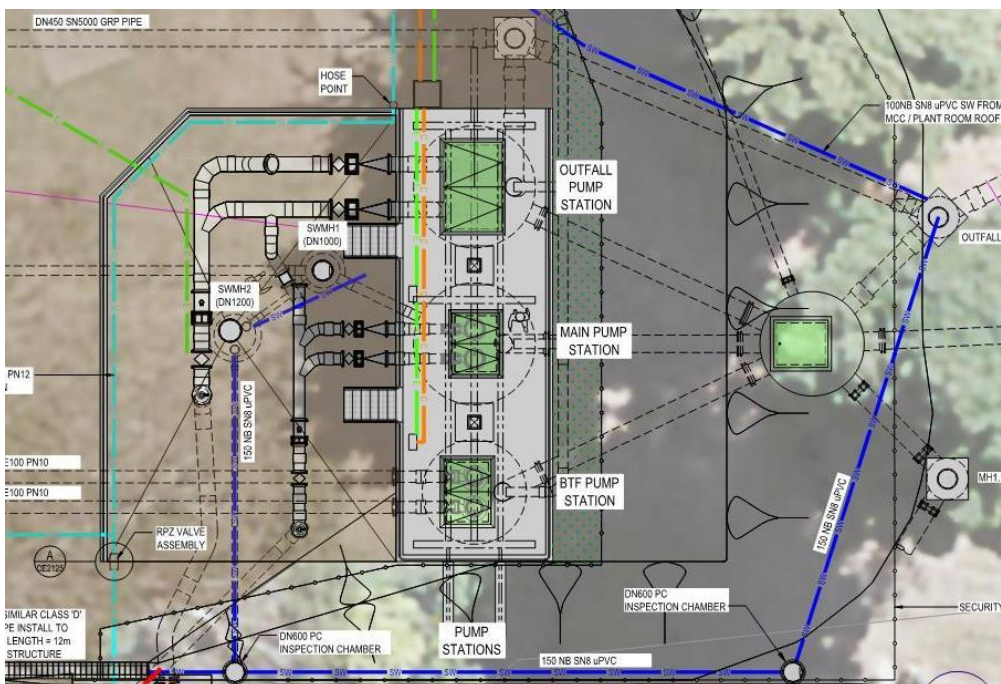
Dublin Street Pump Station site plan layout at detailed design stage (wet wells in the centre, Inlet Chamber to the right and above-ground discharge piping to the left)
